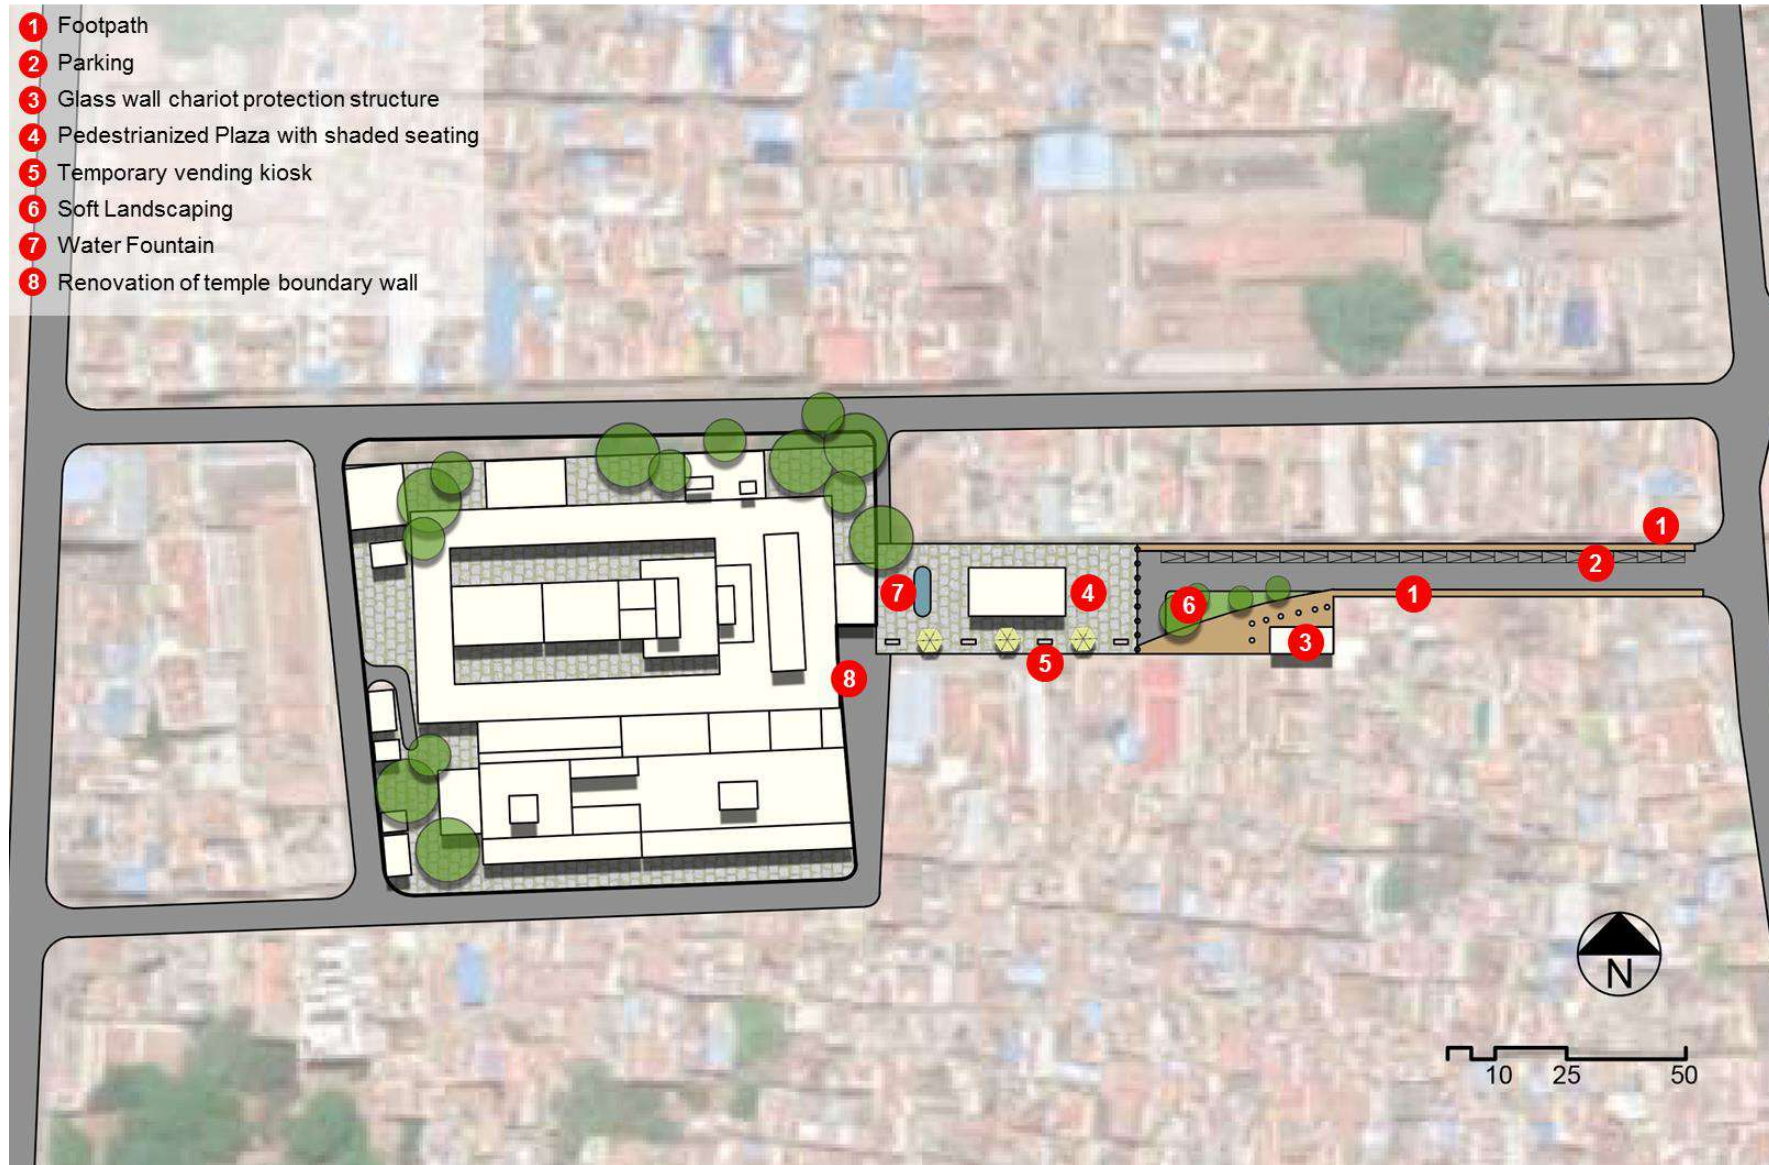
Proposed Master Plan – Koodal Azhagar Temple, Madurai (Temple and Temple Tank)
